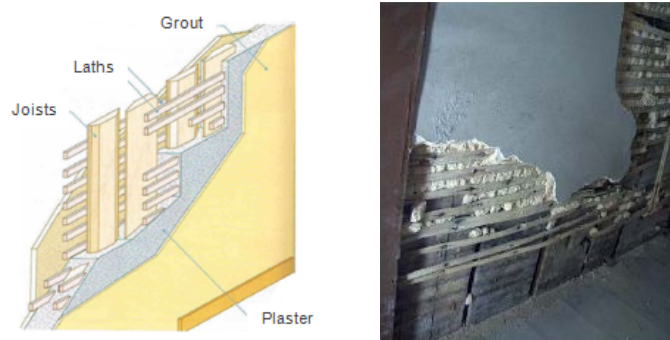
'Tabique' walls (Appleton, 2003 and Pena, 2008).
